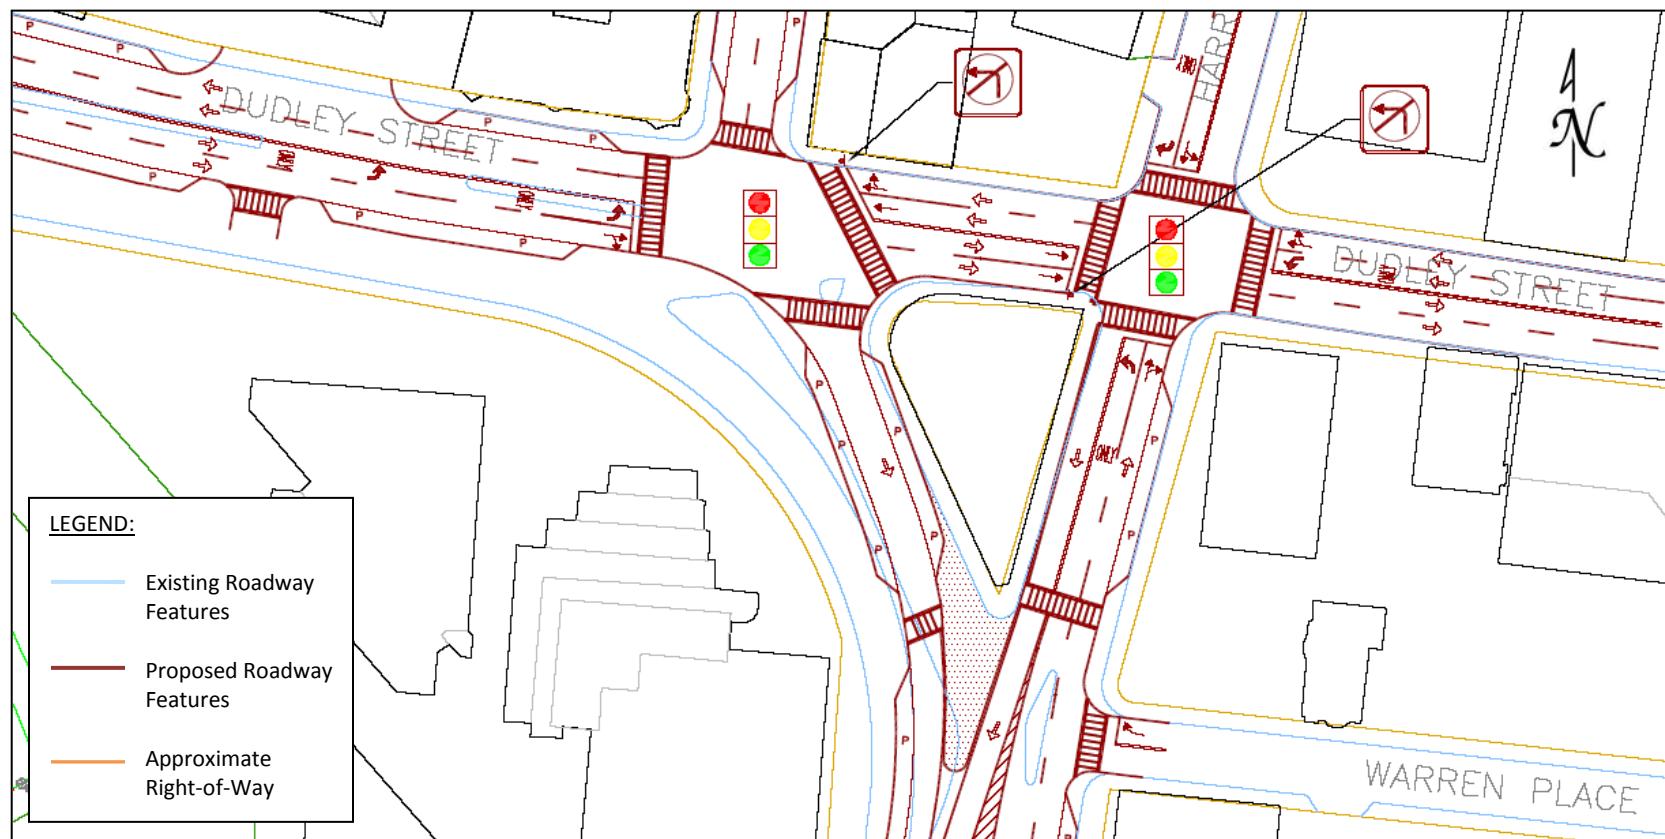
Dudley Street at Harrison Avenue and Warren Street
